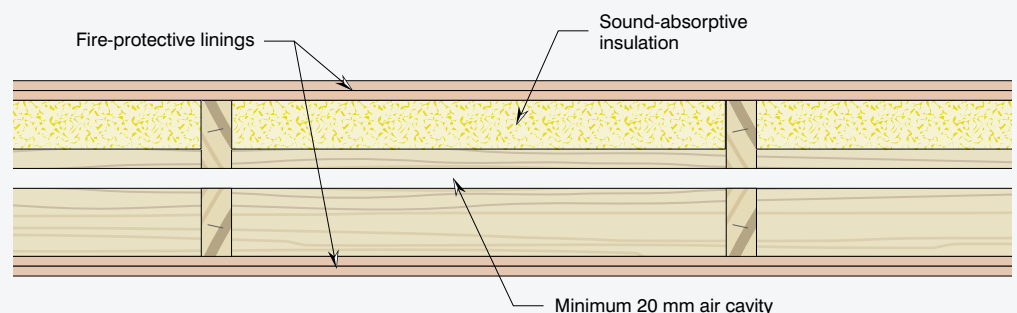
Fire- and sound-rated double stud timber wall – plan view.
